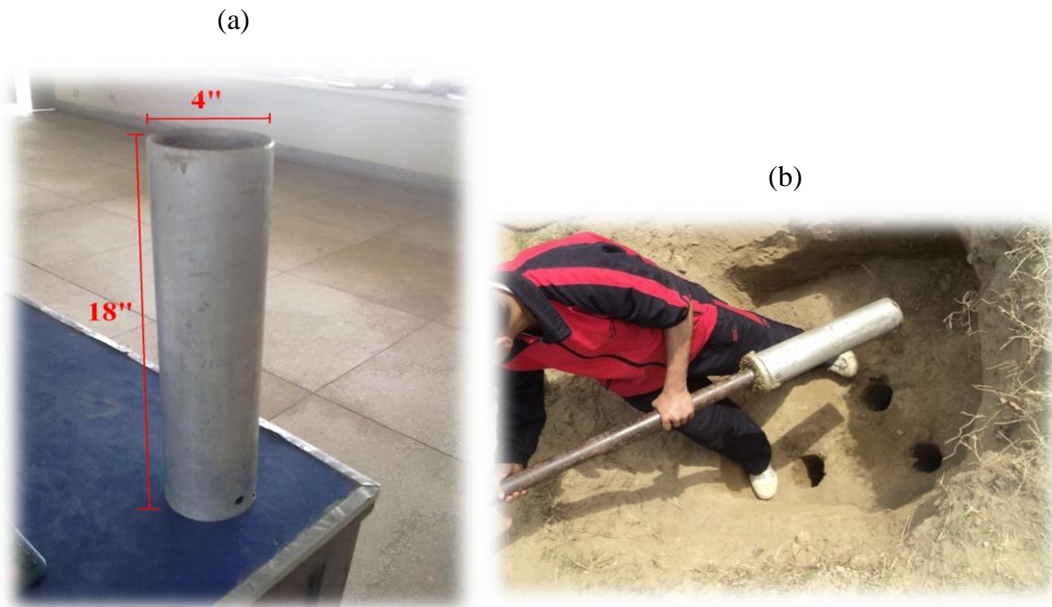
A view of test pit #1 and collection of disturbed samples using split spoon samples.
